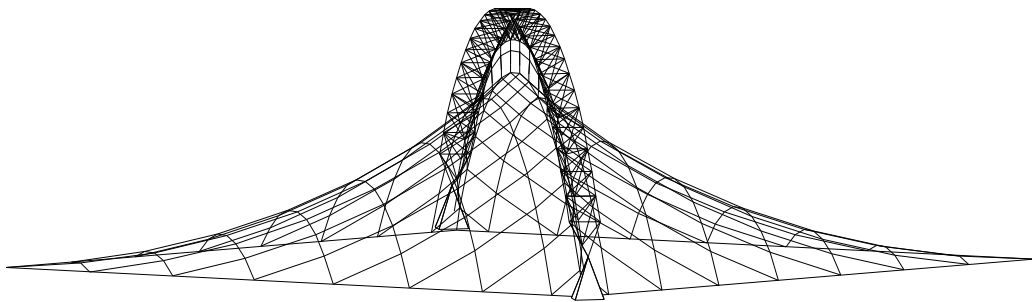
Axonometric view of model 1, cable net supported by a single truss arch
